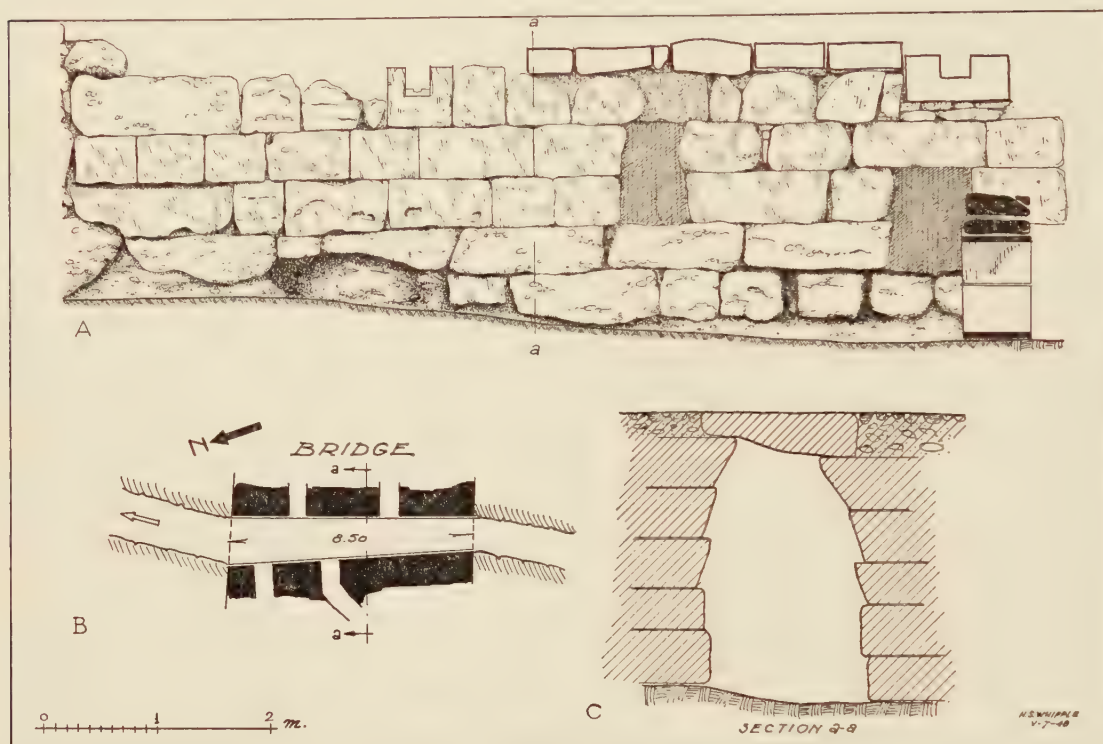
Bridge over Great Drain at Piraeus Street. A—West Wall of Drain, Elevation. B—Plan of Side Drains. C—East-West Section at a-a, Looking North.
